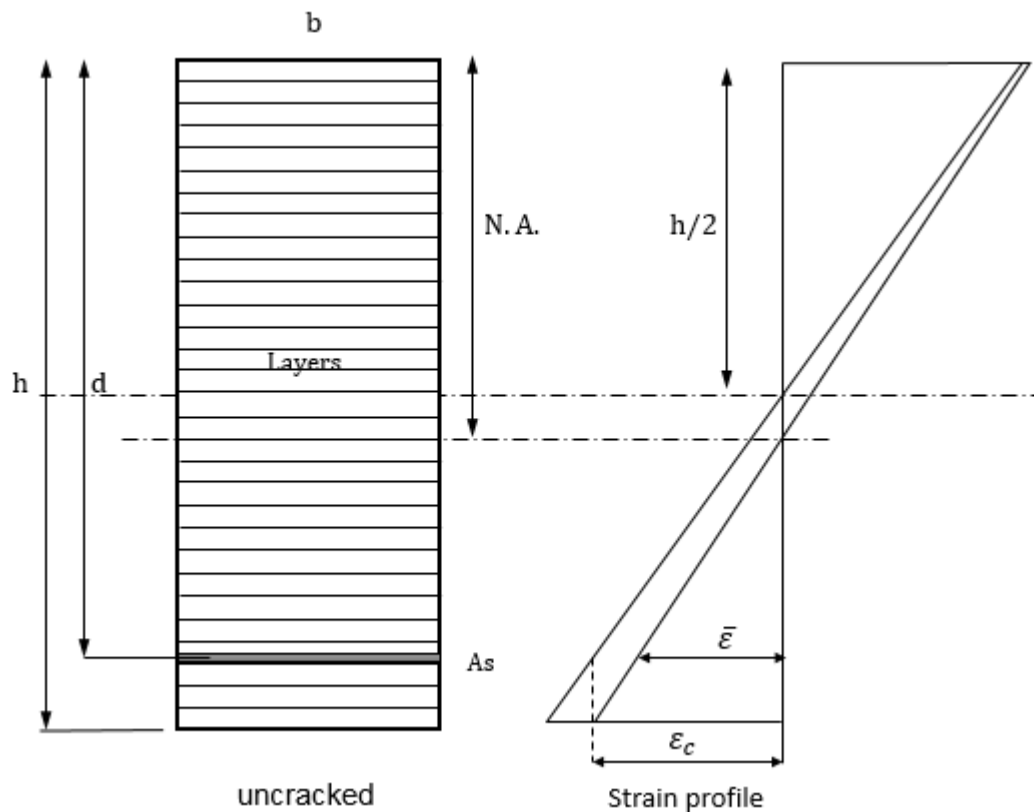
Sectional properties of unreinforced and reinforced concrete
